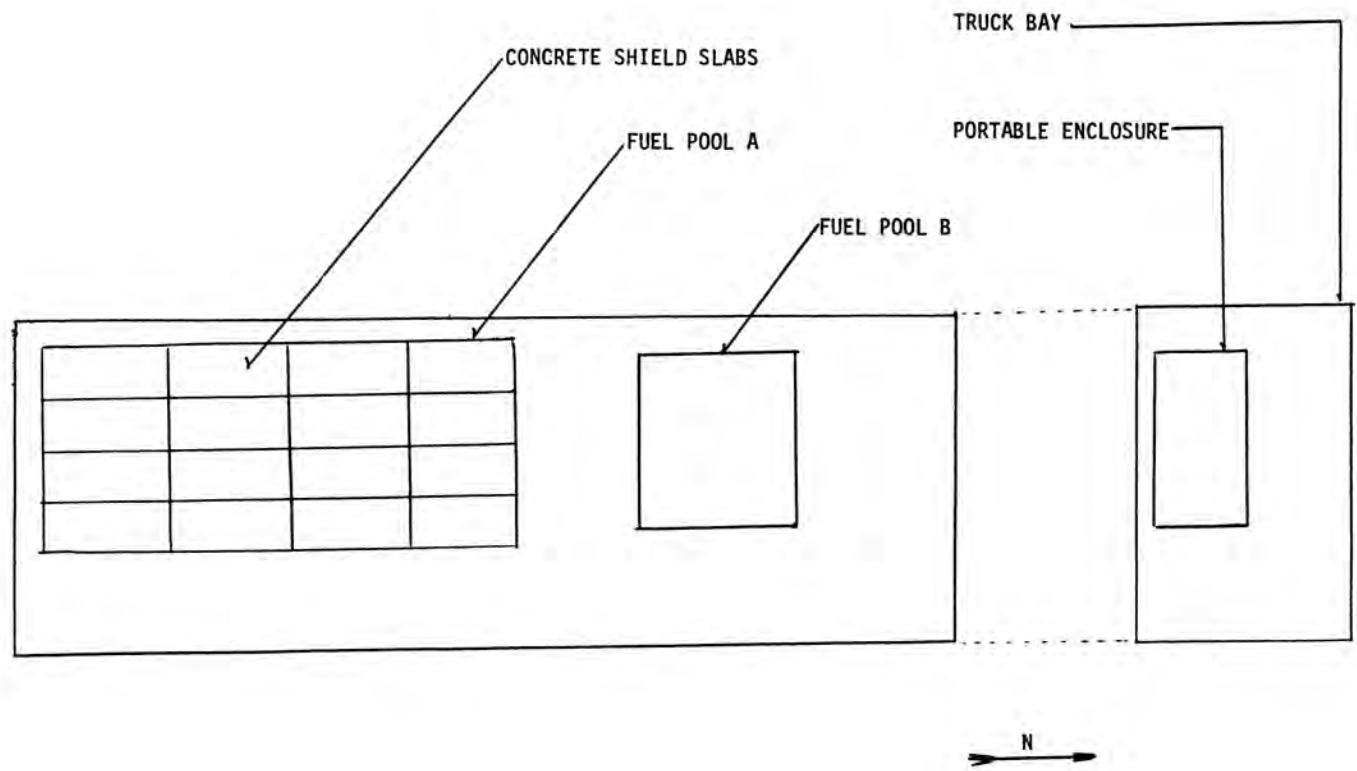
TMI-2 fuel handling building elevation 347'6" (sketch).
